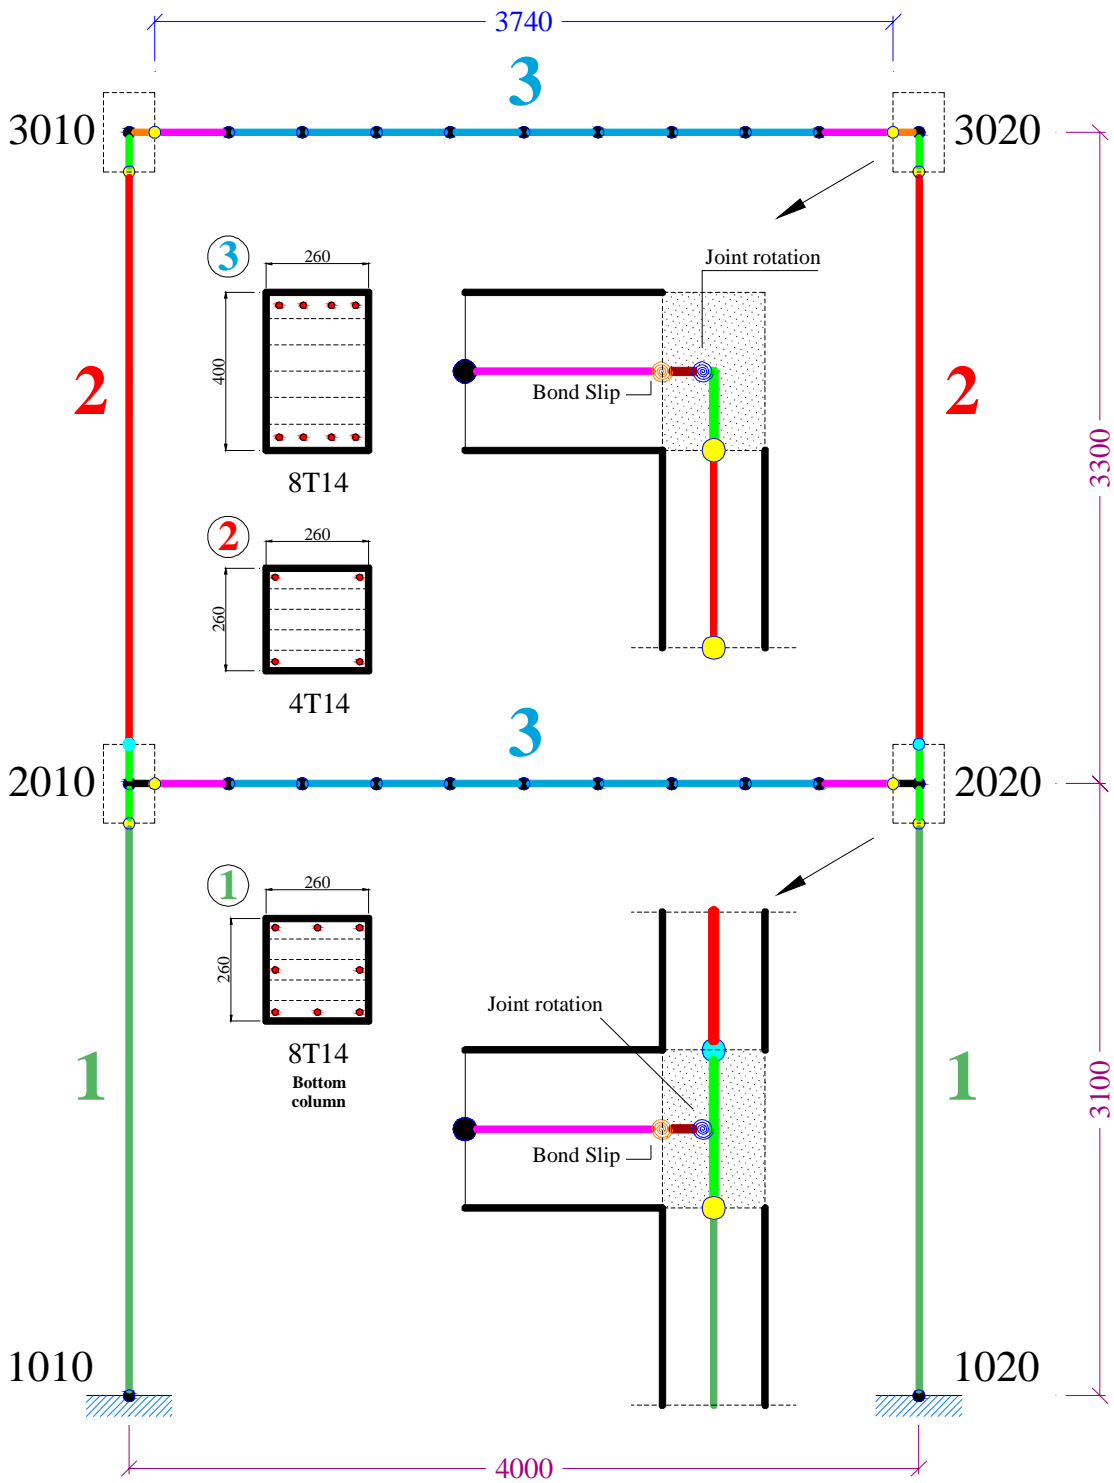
DRAIN-2DX model for BANDIT building with element 15
